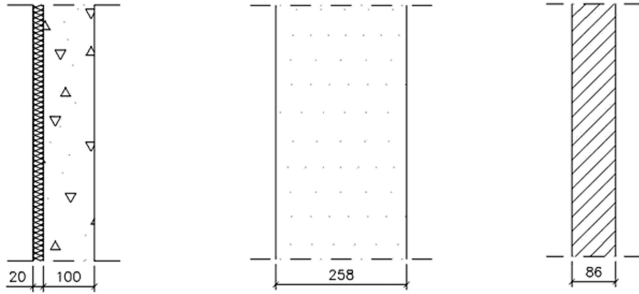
The three different walls used in the case study. From left, a concrete wall with insulation, a lightweight concrete wall, and a wooden wall.
